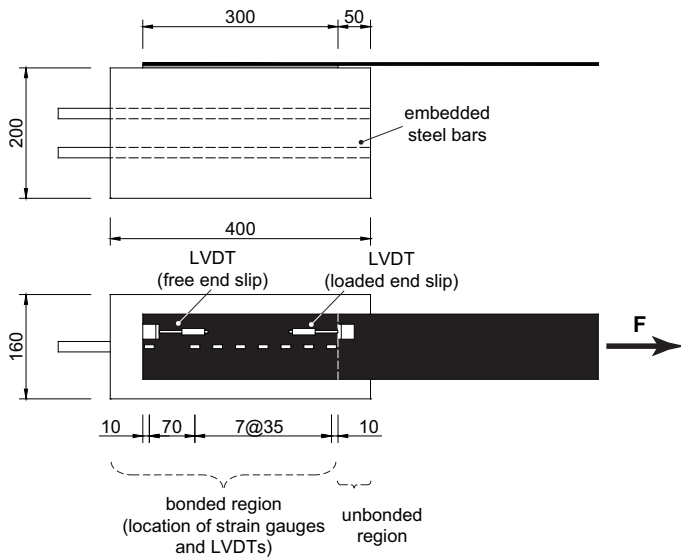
Typical test setup for single shear tests (SS) on EBR.
